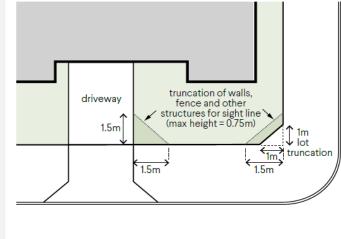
Truncation at street corner to provide sightlines (refer A3.8.7).
